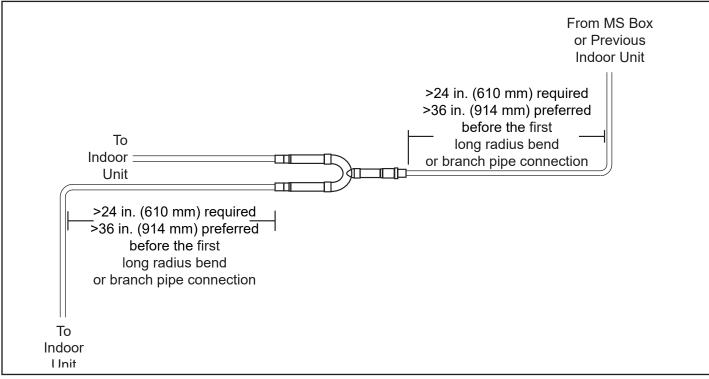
24 to 36" of Straight Pipe Before and After Branch Pipe Kit
